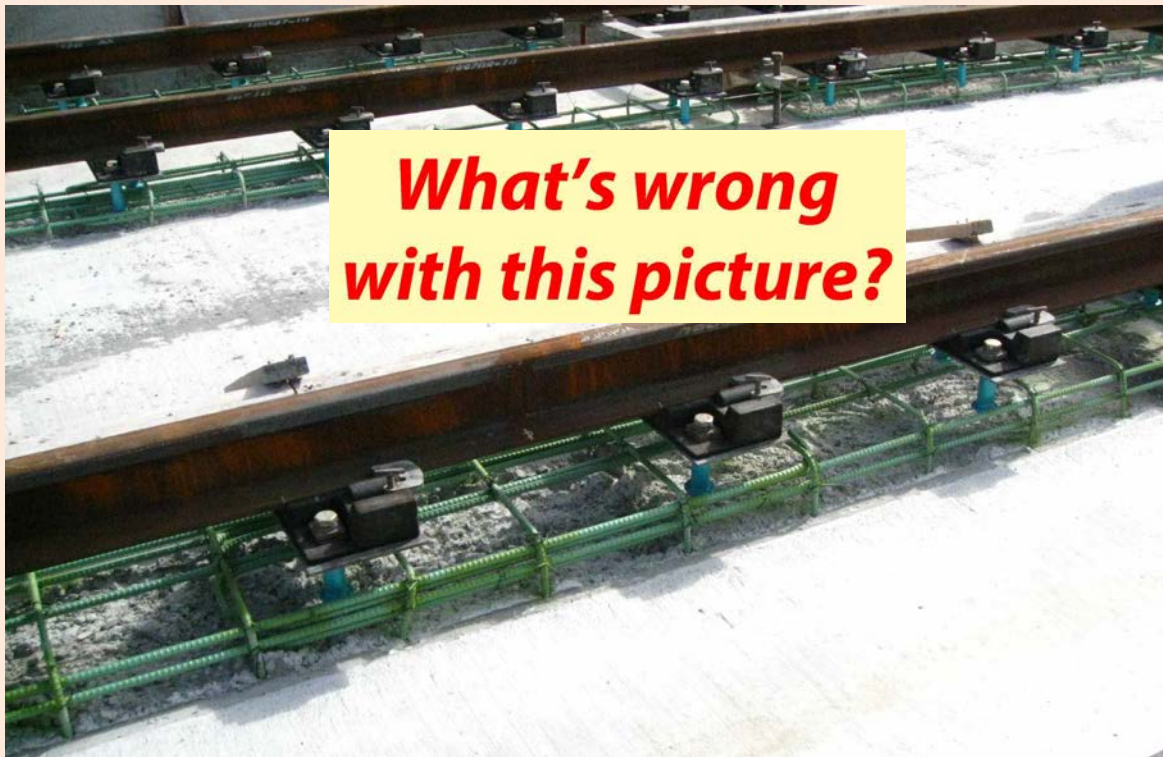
Concrete plinth design—tangent direct fixation track
